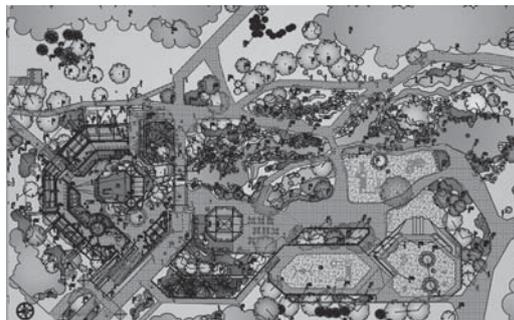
Reconstruction of West Park, Sofia, Detailed Regulation Plan, Chief designer: Arch. Silvia Sokerova, Arch. Dimitar Mladenov, Arch., Ls. Arch. Milen Sariev (Source: Newspaper „Stroitelstvo Gradat“, e-version: <http://gradat.bg>)
